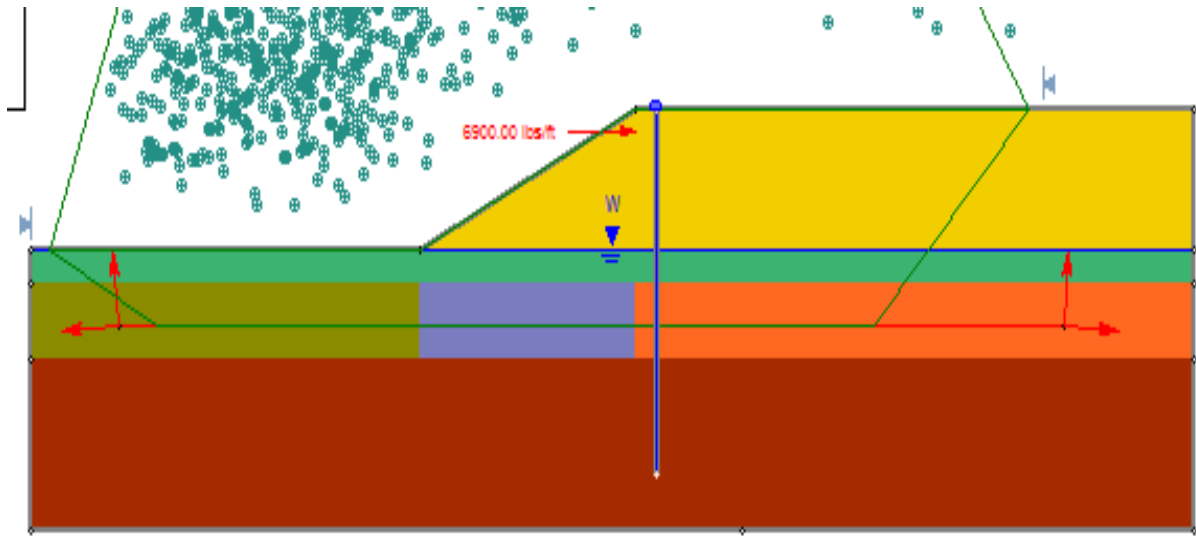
Modified slope stability model with pile support ($k_y=0.187$)
